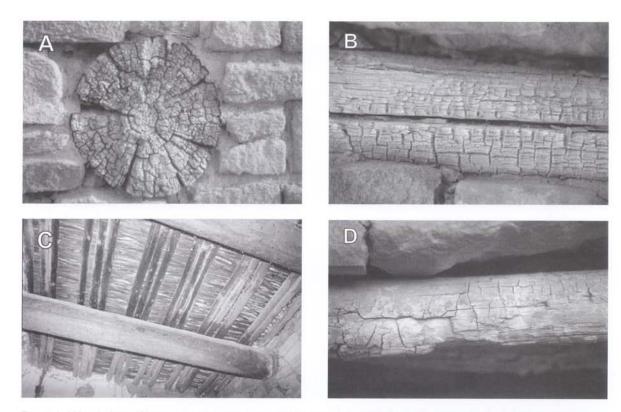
Figure I. Woods from Chacoan great houses showing their current condition. (a). End of a pine beam showing severe deterioration with large cracks and crevasses in the wood. (b). Lintel showing surface weathering and deterioration. (c). The roof of a room in Aztec ruins that had been protected from the environment, showing relatively sound beams and secondary support structures. (d). Advanced stages of decay in a lintel. The structural integrity of the wood has been greatly compromised and parts of the lintel have been lost through fragmenting and detachment of the decayed wood.
